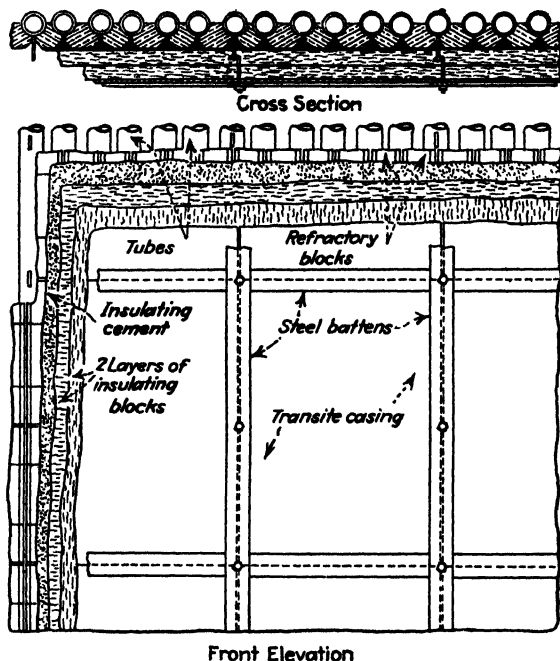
Insulating blocks supported by a rigid casing. (Courtesy of the Johns-Manville Co.)
